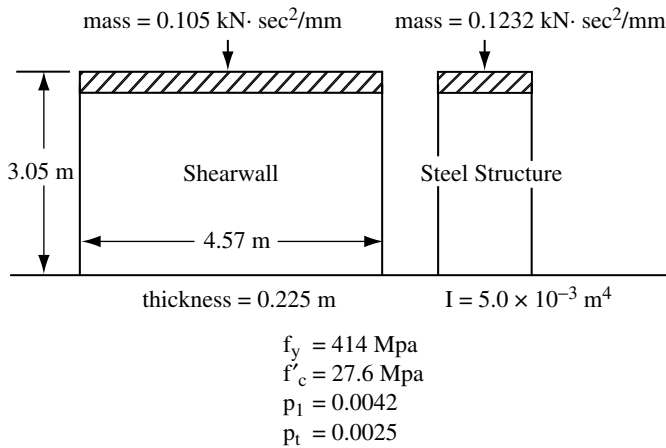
A framed shear wall that interacts with a steel structure.
